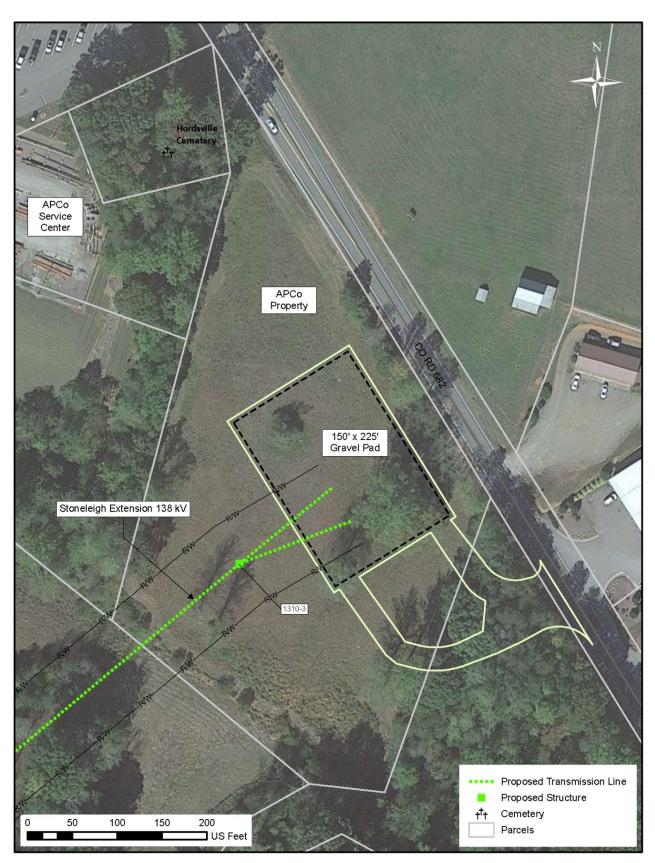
Proposed 138-kV Stoneleigh Substation
